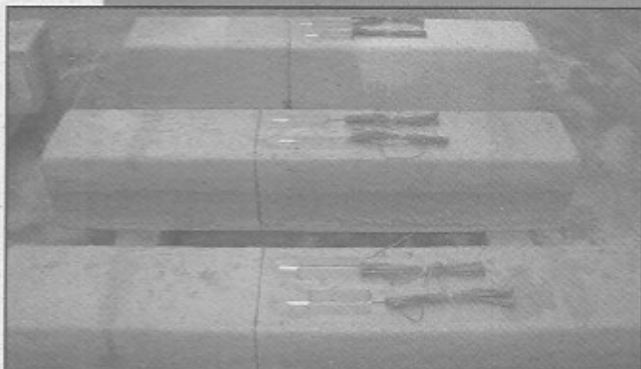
Reinforced concrete beams sprayed with GFRP composite after 12 months exposure to a manure environment
